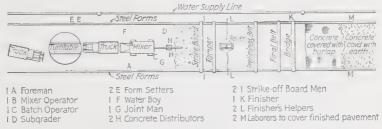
Concrete paving plant layout with three-bag mixer.
